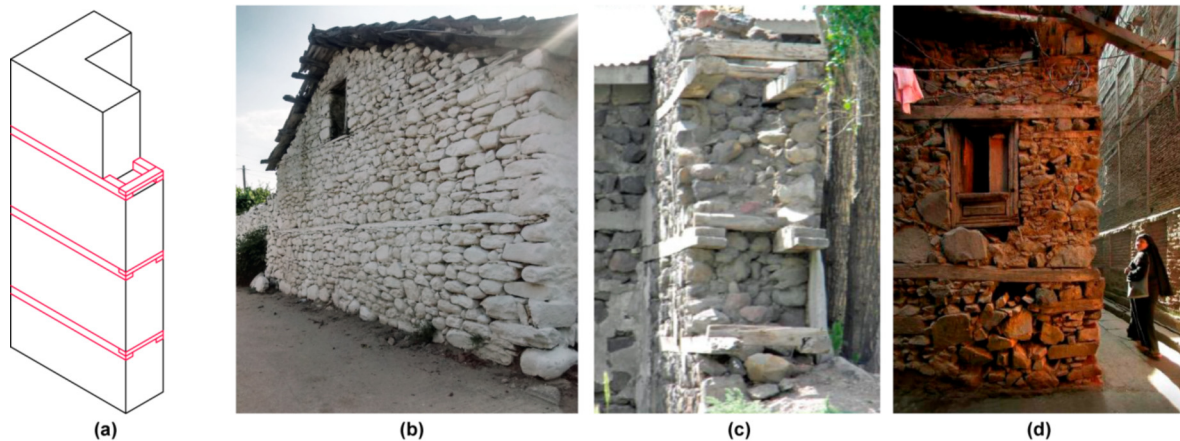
(a) Traditional way of inserting horizontal timber elements within the masonry walls; (b) timber-laced wall in Greece; (c) timber-laced wall or “hatil” in Turkey [78]; and (d) timber-laced wall or “taq” in India [11].
